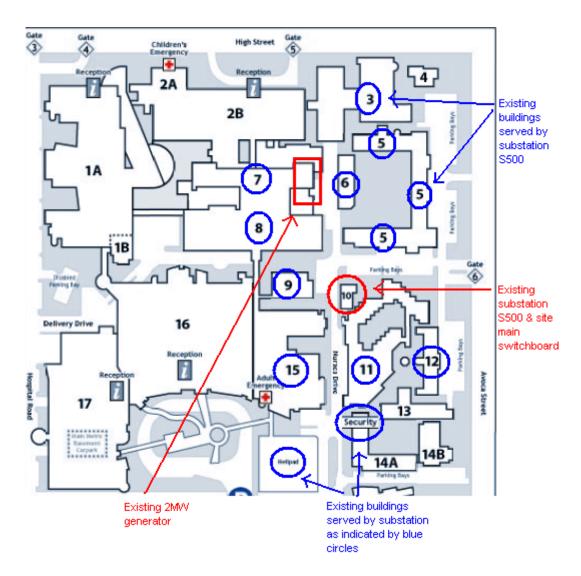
Site Plan showing Substation S500 and existing associated building loads
